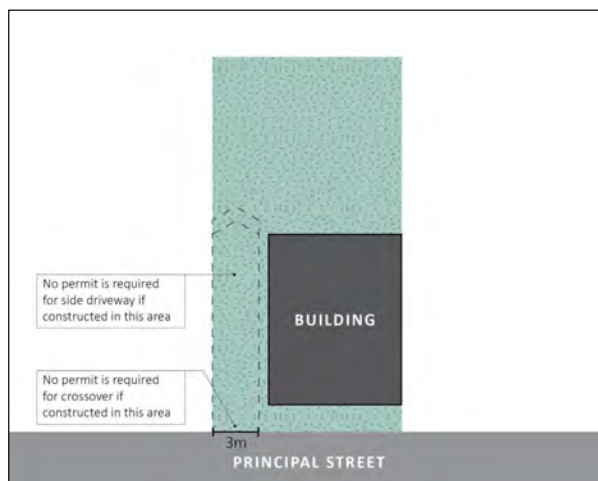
Construction of a new crossover and driveway is permit exempt if constructed in this location.
